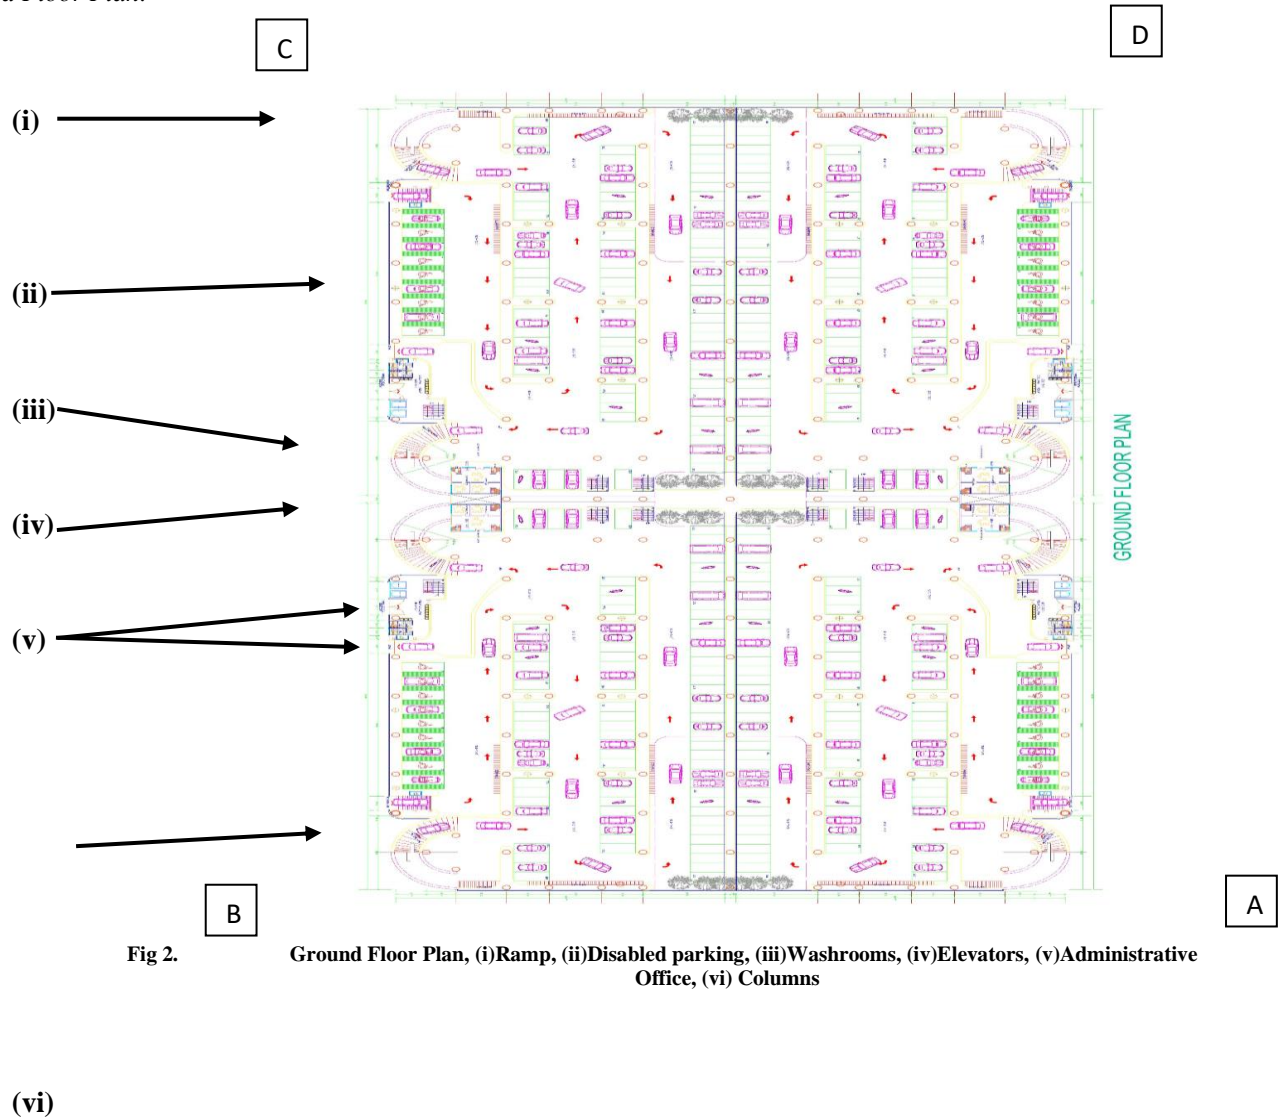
Ground Floor Plan, (i) Ramp, (ii) Disabled parking, (iii) Washrooms, (iv) Elevators, (v) Administrative Office, (vi) Columns
